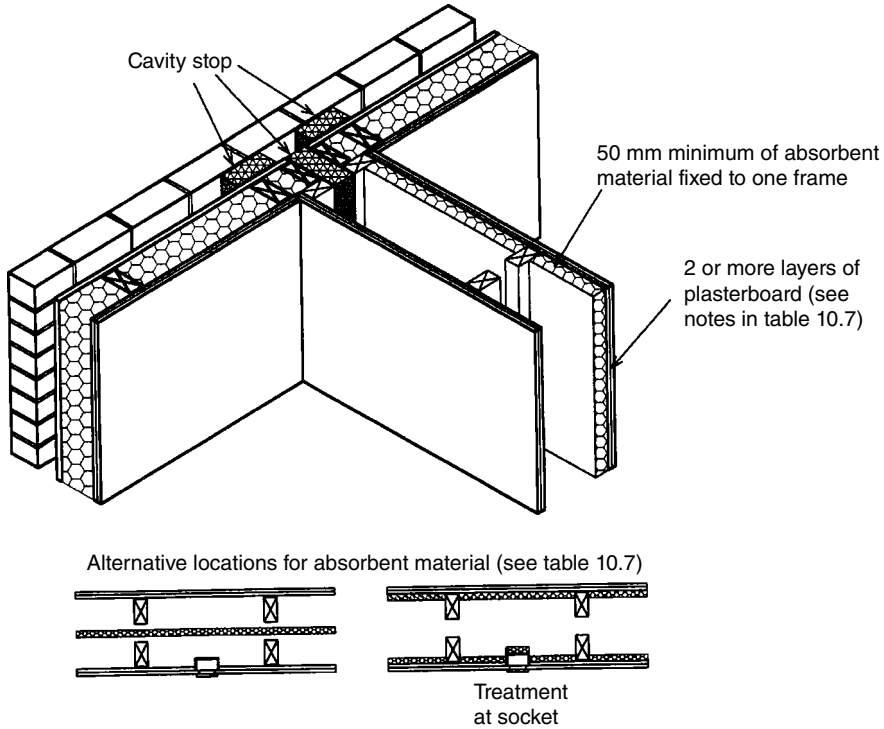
Details of timber-framed separating wall with absorbent infill.
